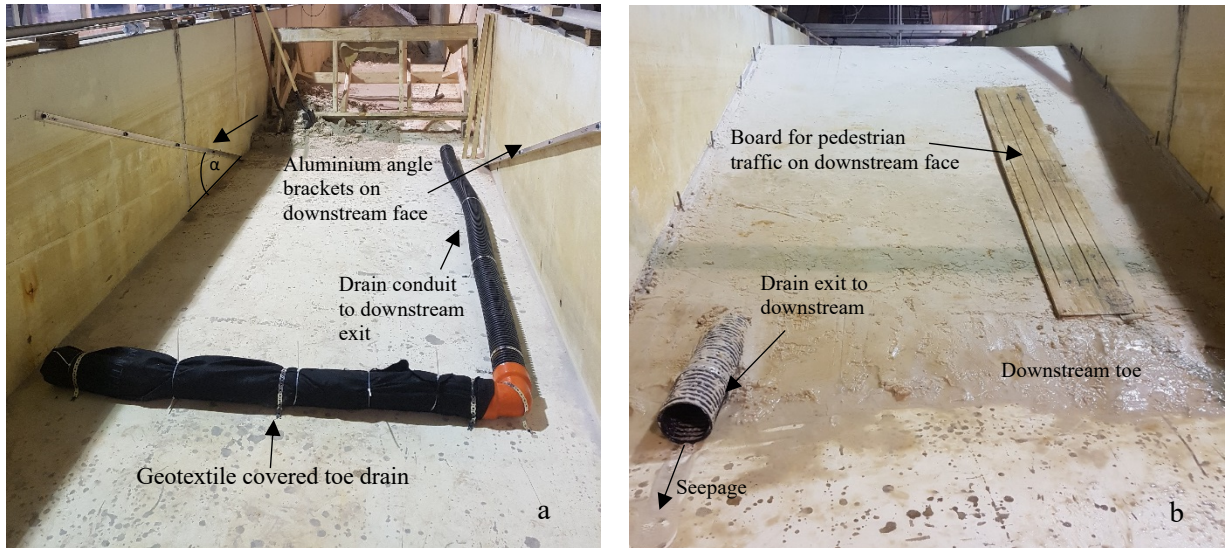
Dam toe drain. (a) Drain anchored to flume base; (b) Downstream view of drain outlet post dam construction
